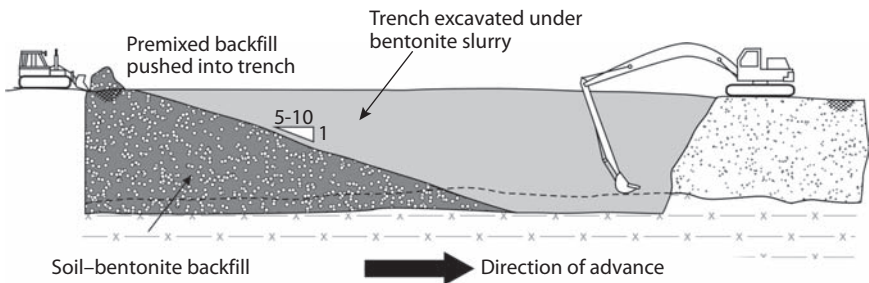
Construction sequence for soil–bentonite slurry trench wall.
